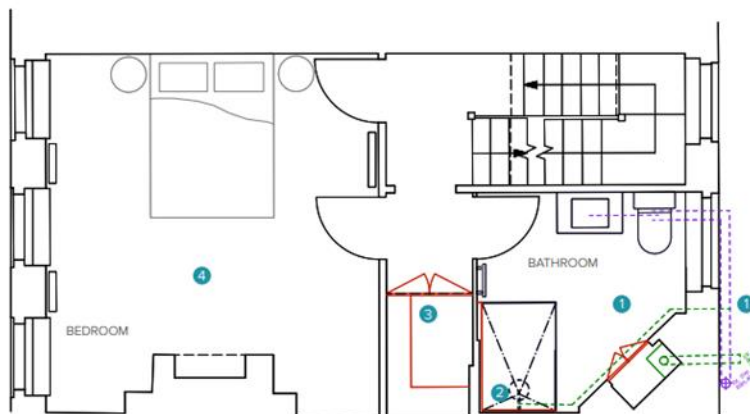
Proposed First Floor Plan (Archer and Braun Architecture)
